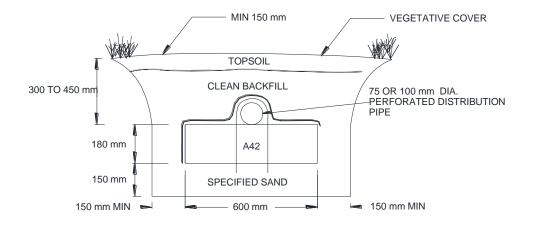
TYPICAL ELJEN GSF A42 CROSS SECTION
